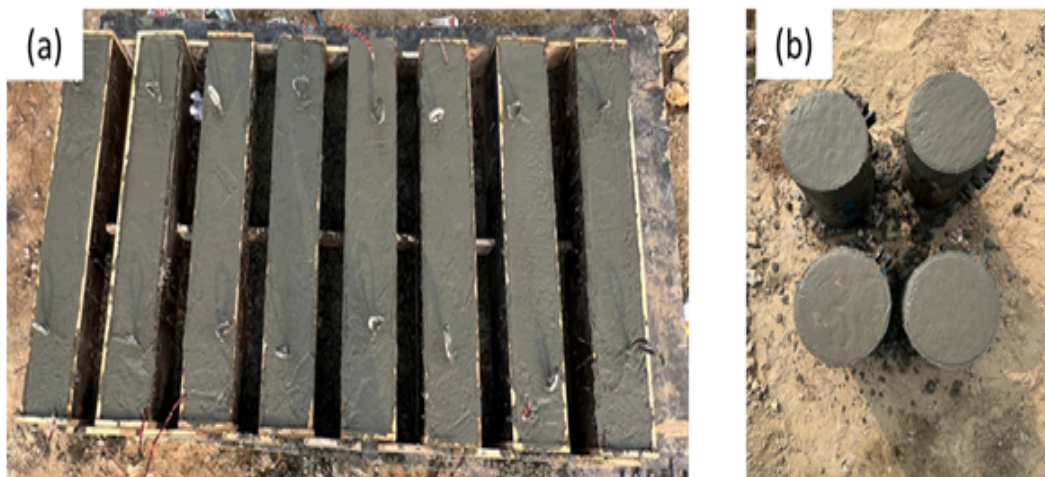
Casting of specimen RC beams and Cylinders (a) RC beams (b) Cylinders
